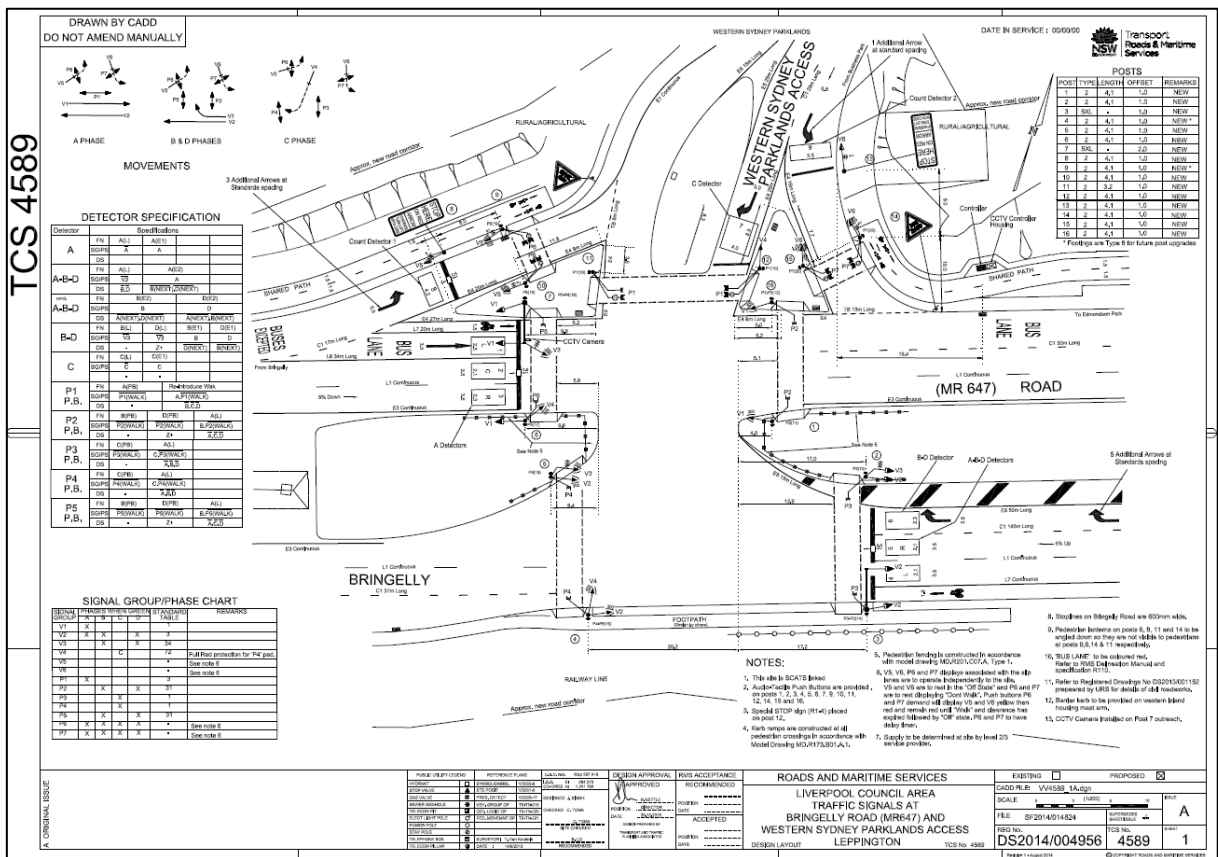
Intersection Bringelly Road & Skyline Crescent – TCS Plan
